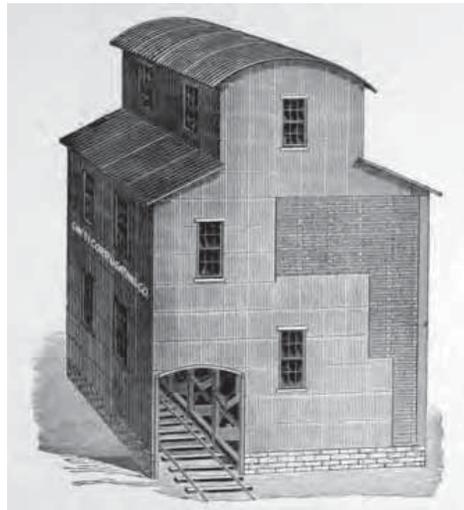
An example of a simple building covered with corrugated metal siding and an arched roof (Cincinnati Corrugating Company 1893:7).
